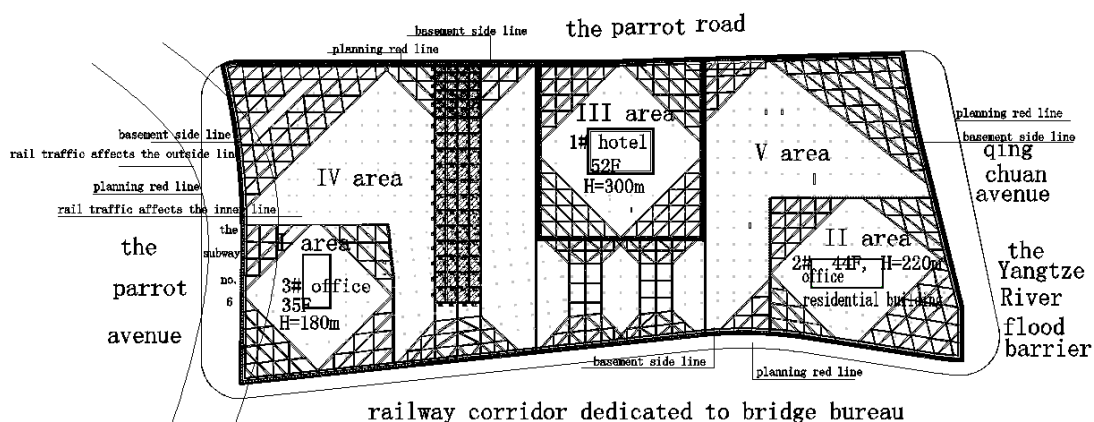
Plan of foundation pit and surrounding environment and partition diagram
